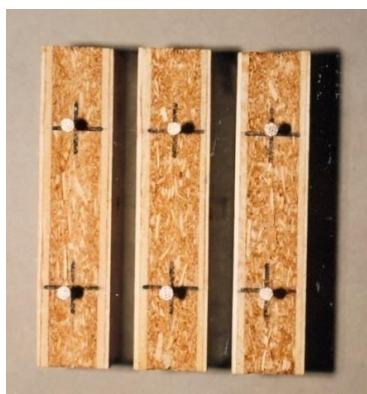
Test specimens for determination of nail withdrawal resistance parallel to the plane of composite panels
